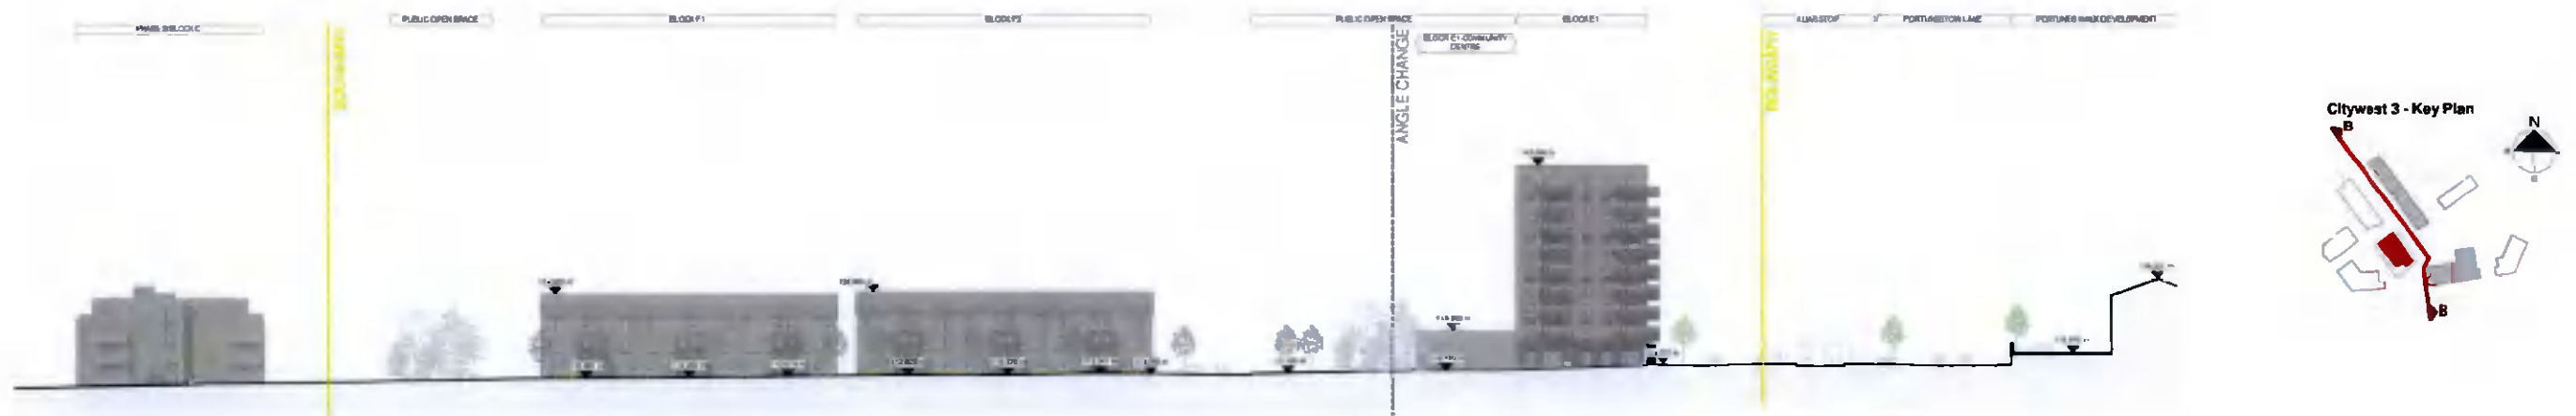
Site section B-B - (No change to Permitted Section B-B grant ABP-310570-21)
